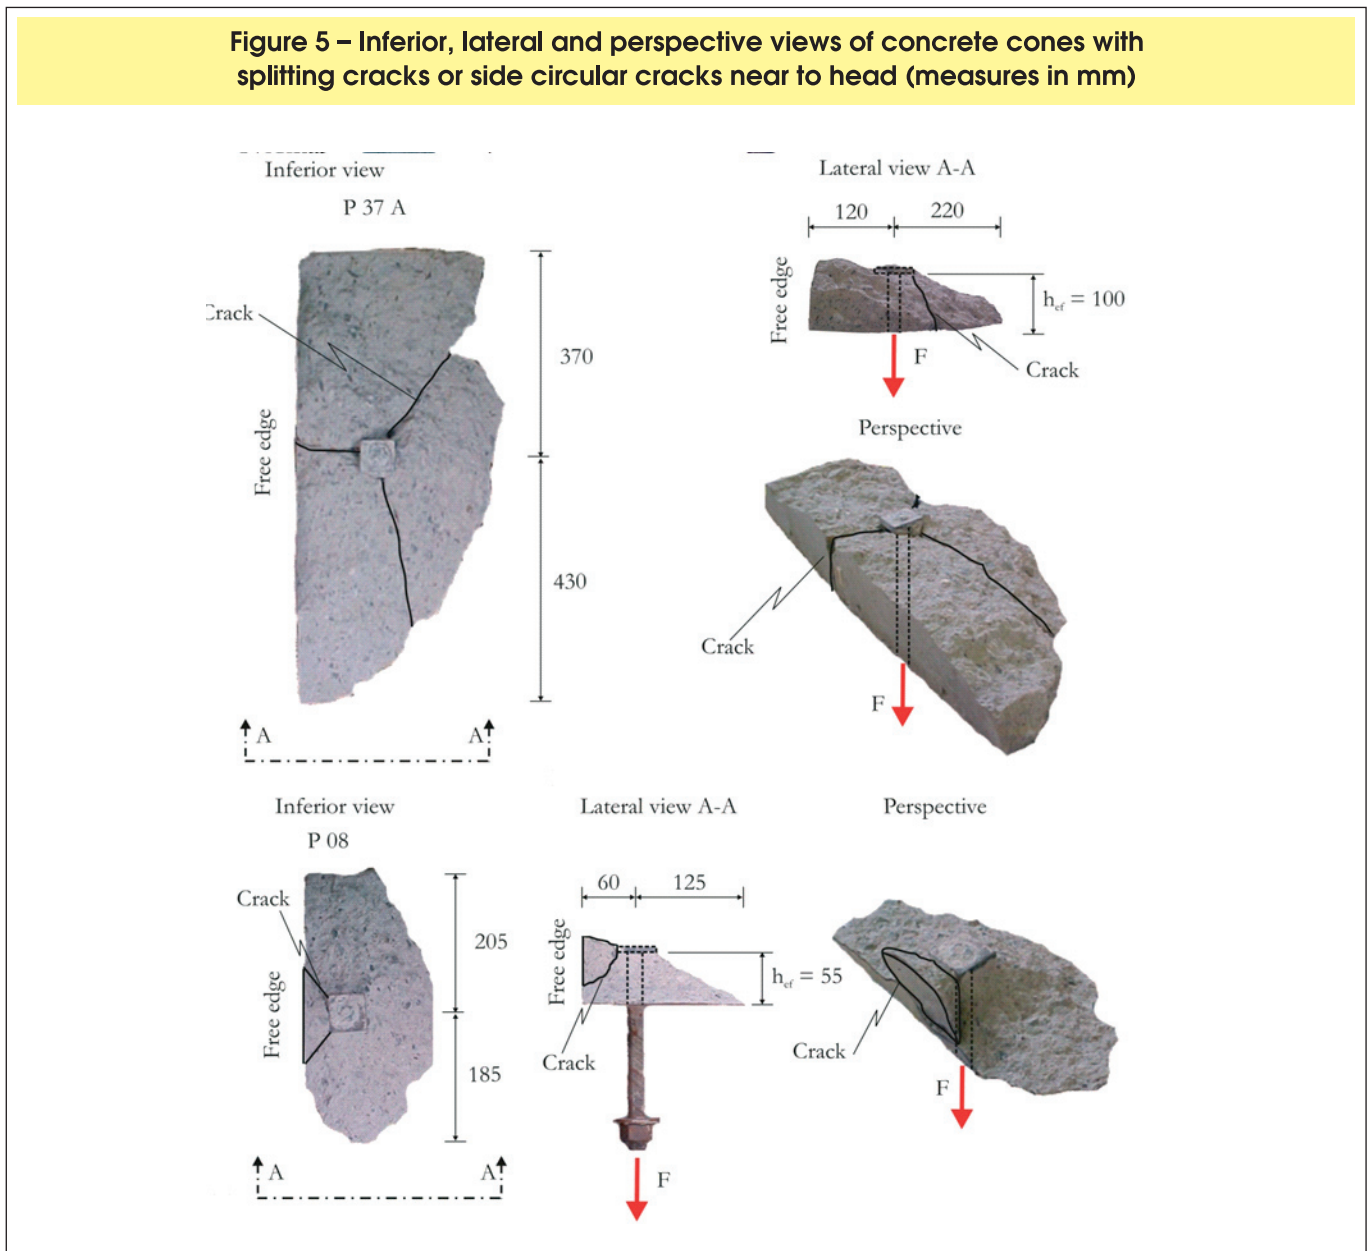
Inferior, lateral and perspective views of concrete cones with splitting cracks or side circular cracks near to head (measures in mm)
